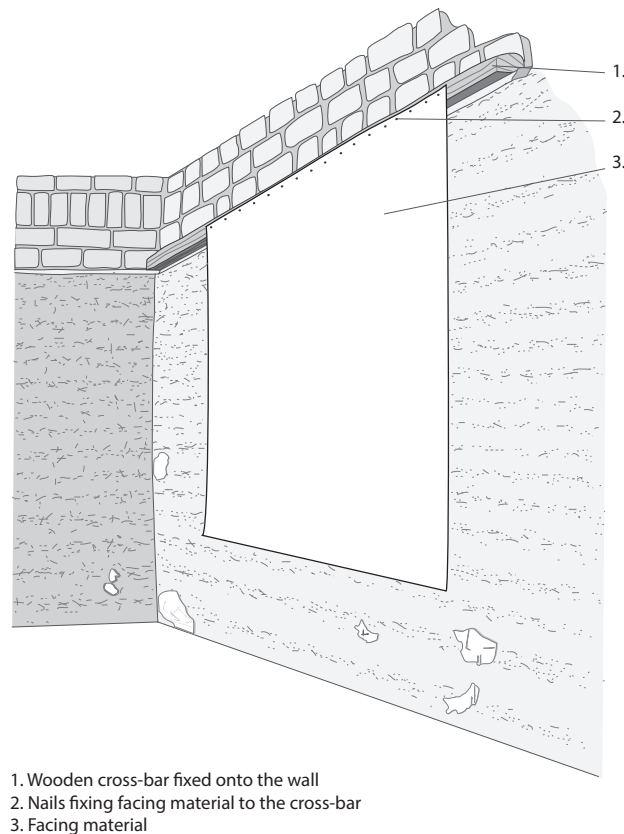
An example an external support system to which extra facing material is attached (image Claire Thorne)
